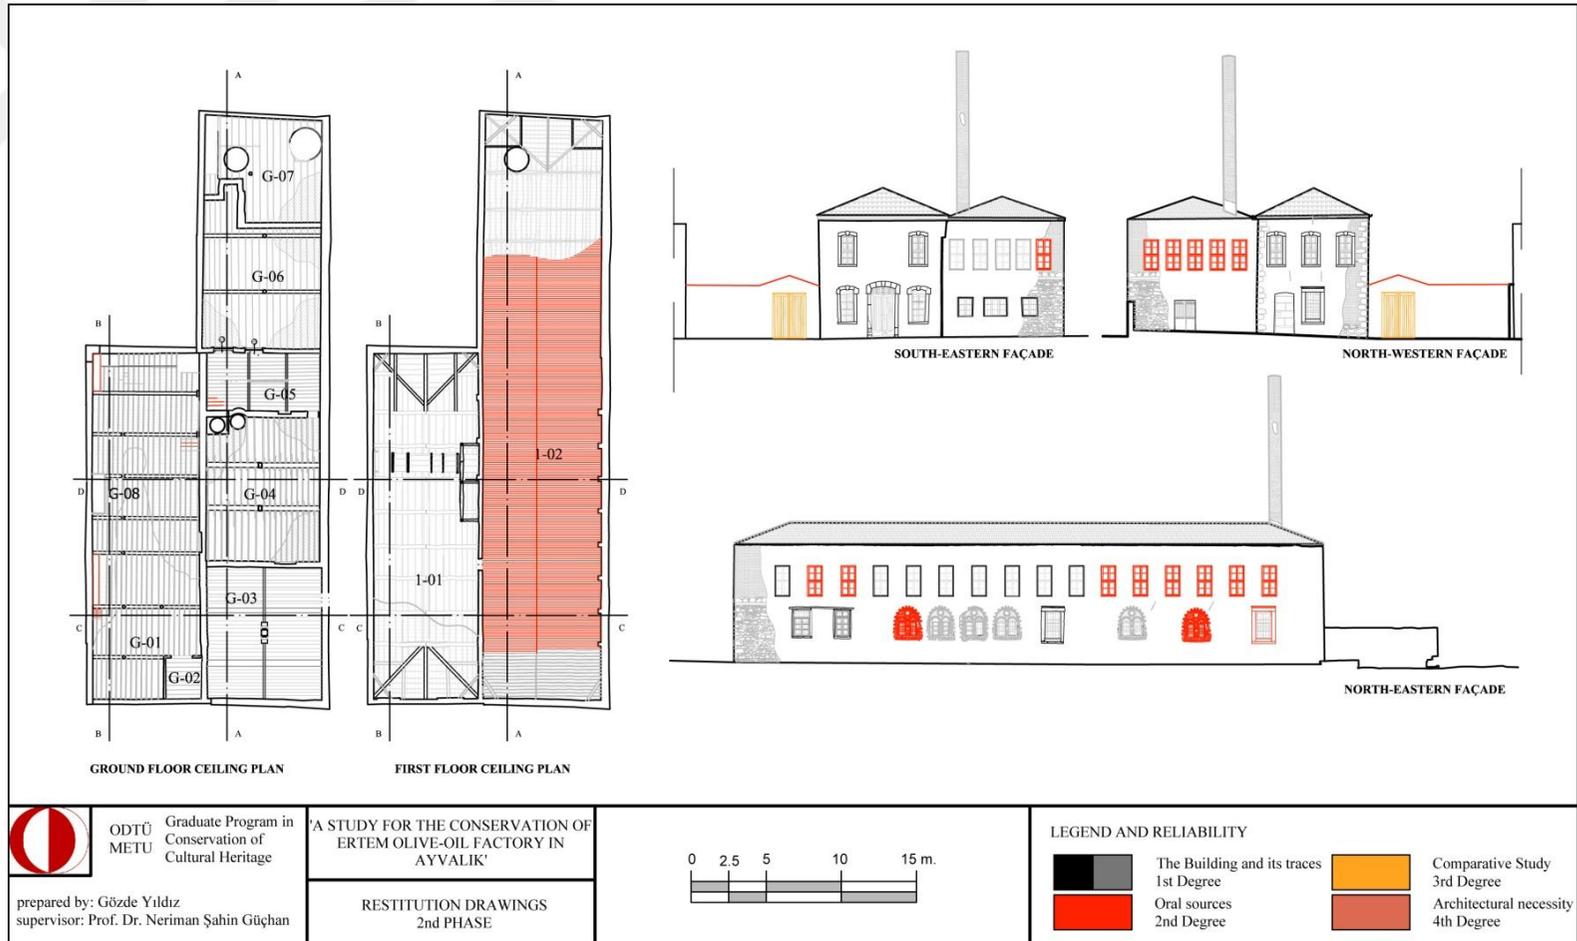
2nd Phase of the Factory, ceiling plans and façades
